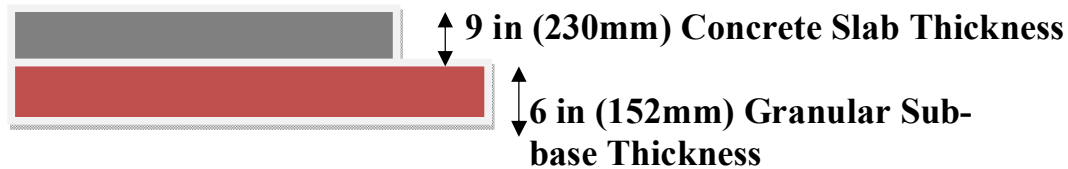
Road A Layers Pavement Thickness According to AASHTOO Method
